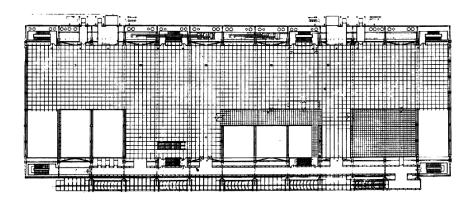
Pompidou Cultural Center, the First Floor Plan (26)
